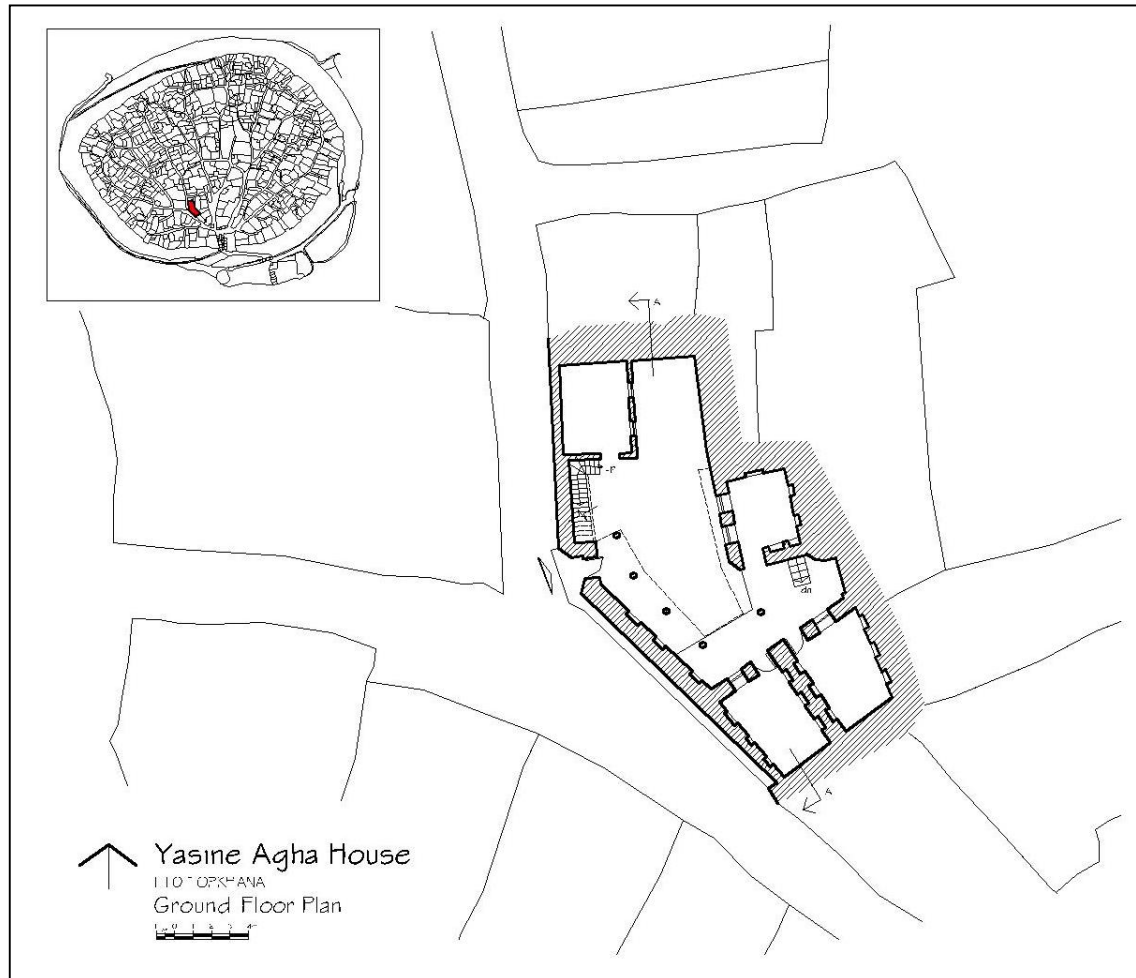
Plan of the ground floor in Yasine Agha house (HCECR, 2012)
